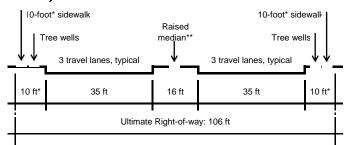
Ball Road (Between West Place and Cast Place) Cross Section
